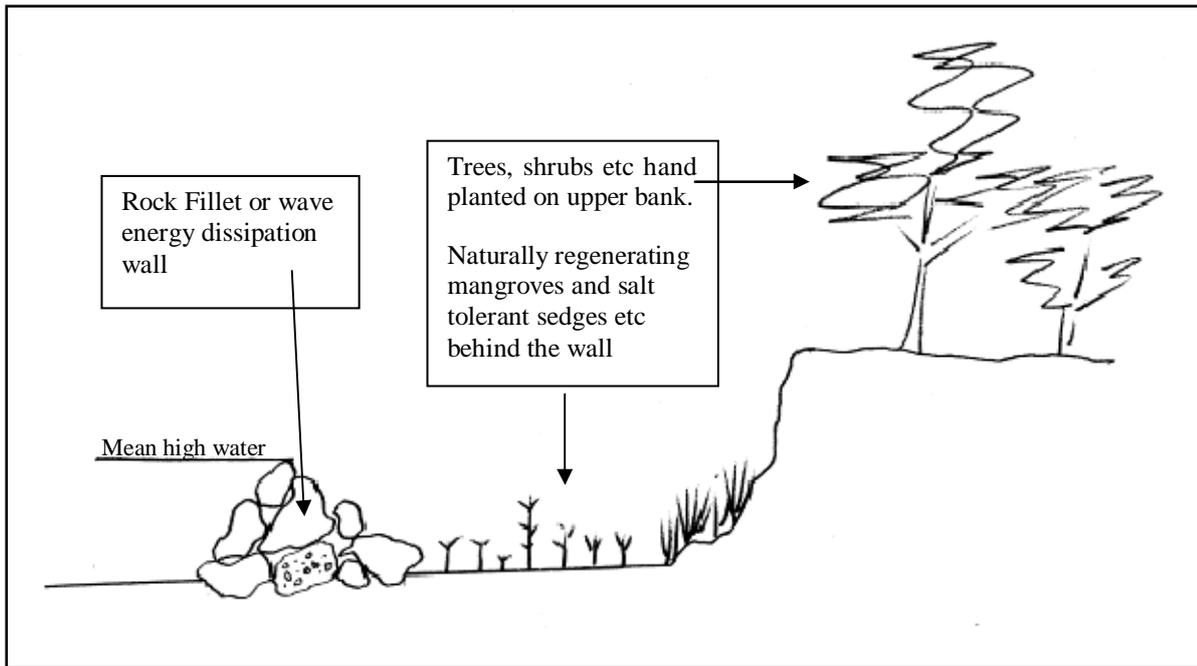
Cross-section showing the layout of a typical rock fillet project.
